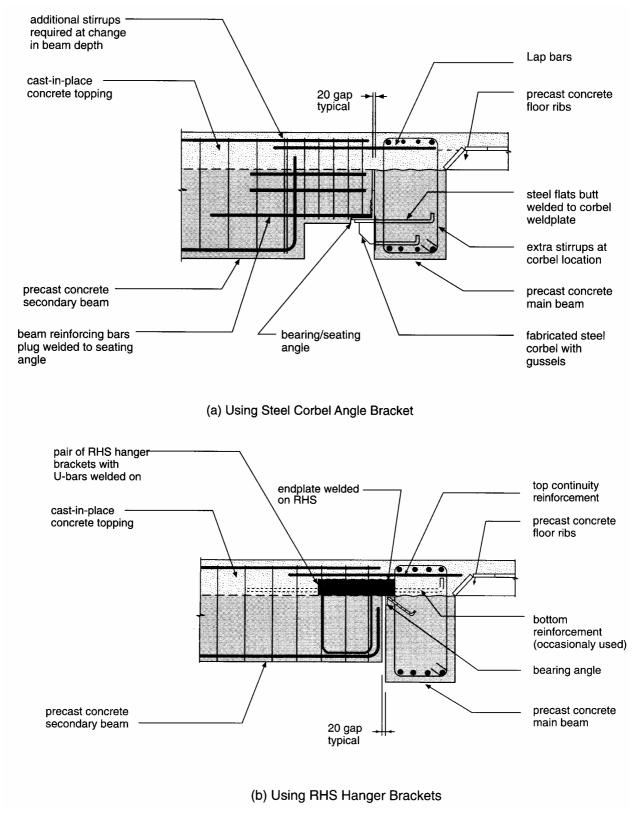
Examples of pinned joints at secondary beam to main beam connections [Centre for Advanced Engineering (1999)]
